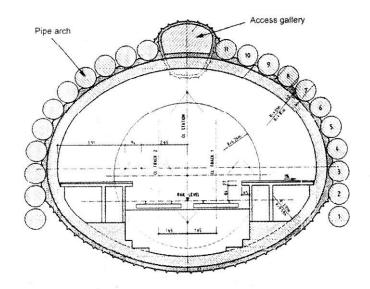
Improvised Pipe Arch above Tunnel Crest at Monastiraki Metro Station
